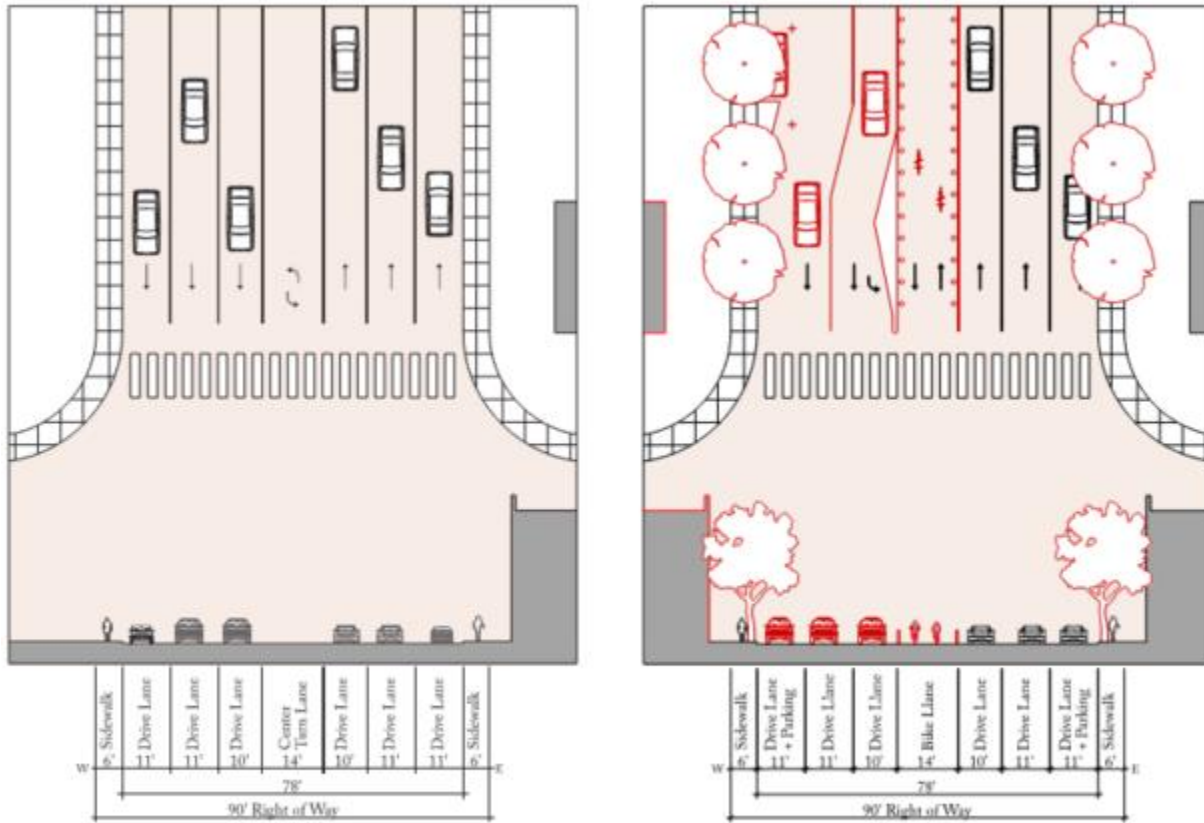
Beverly Boulevard at Wilcox Avenue
